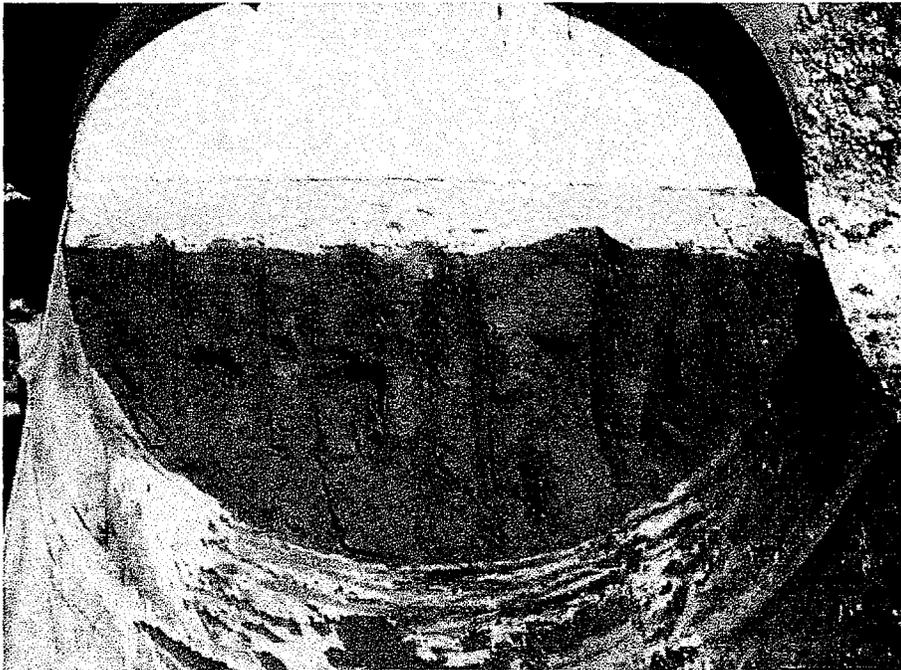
Test 3, Grout Removed to Between 11 in. and 12 in. From End. Approximate position of second accumulator plate from. No sand deposits apparent at this cross section.
